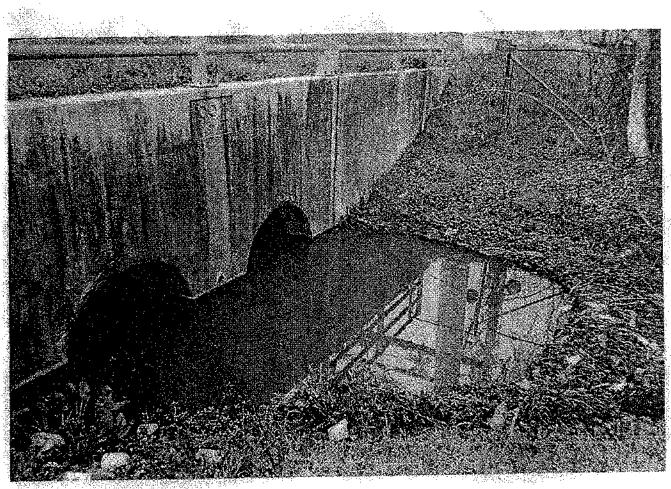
Bridge near sampling location at Hunter park at Willow Glen Road. (Note the date on the bridge is 1994).
